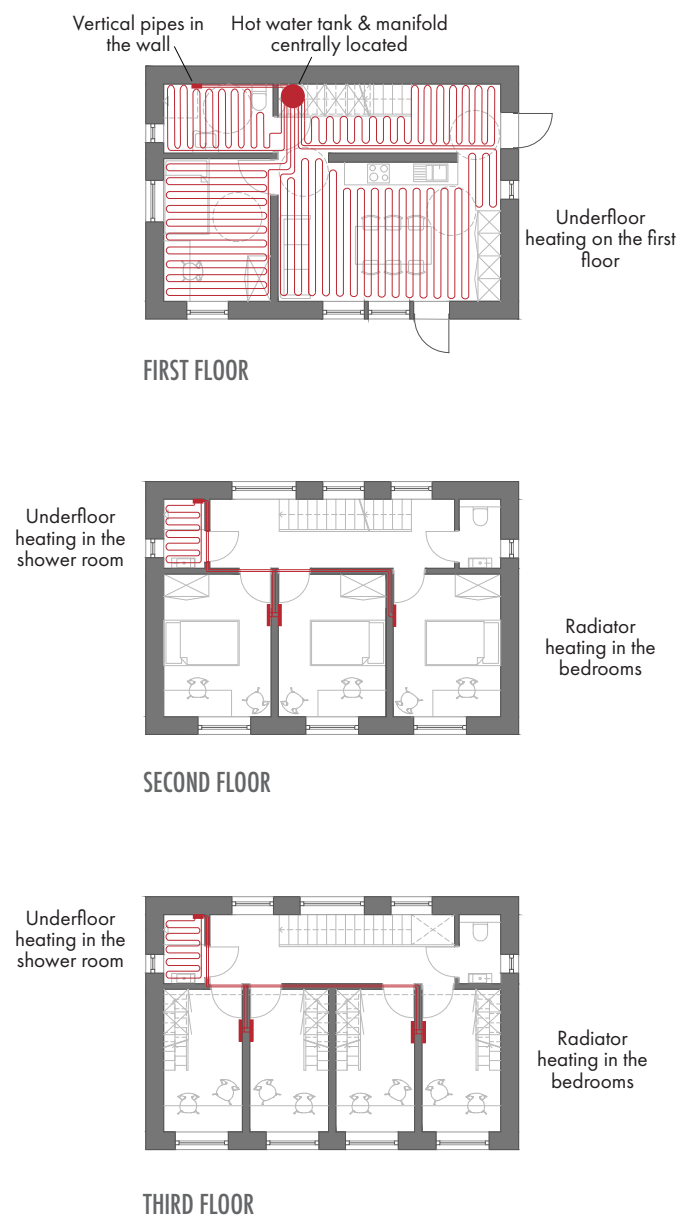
PLAN VIEW OF THE HYDRONIC SPACE HEATING SYSTEM, SCALE 1:200
